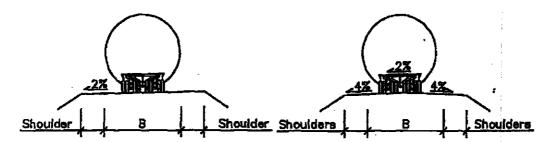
Roof profile. The effective running width, B must be a minimum of 5m (16 ft) exclusive of shoulders on straight sections of the road.
